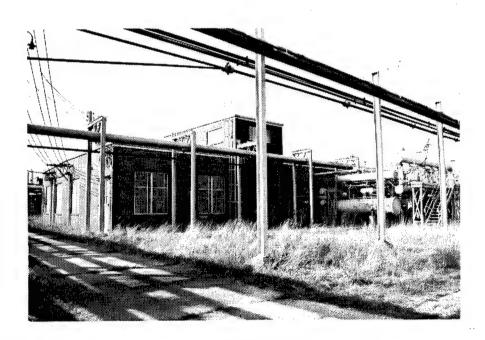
Building 226-2: Hydraulic Refrigerator House.
